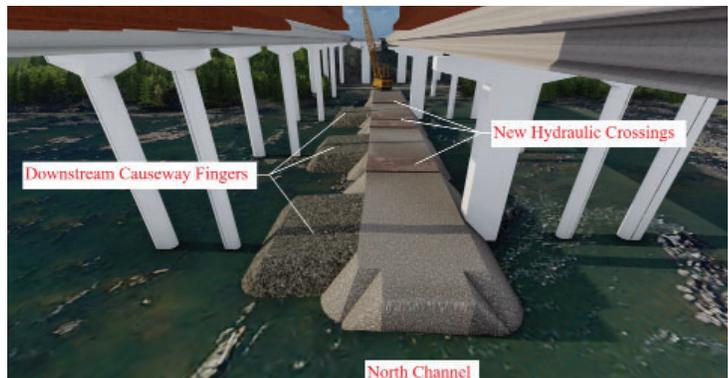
Second Causeway Modification Looking South, North Channel in the Forefront
